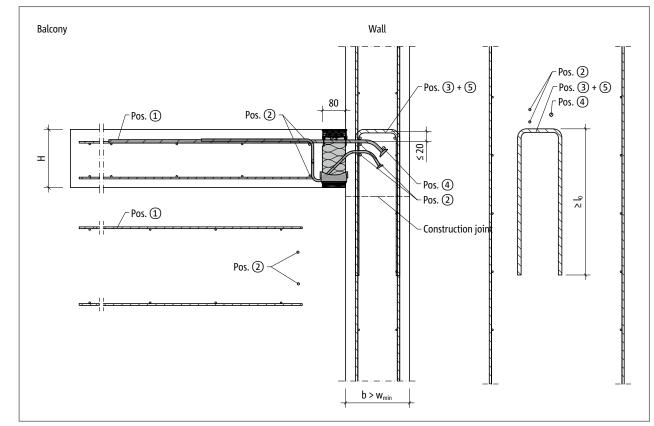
Schöck Isokorb® T type K-O: On-site reinforcement for wall connection with larger structural element dimension (wexist= wmin)
